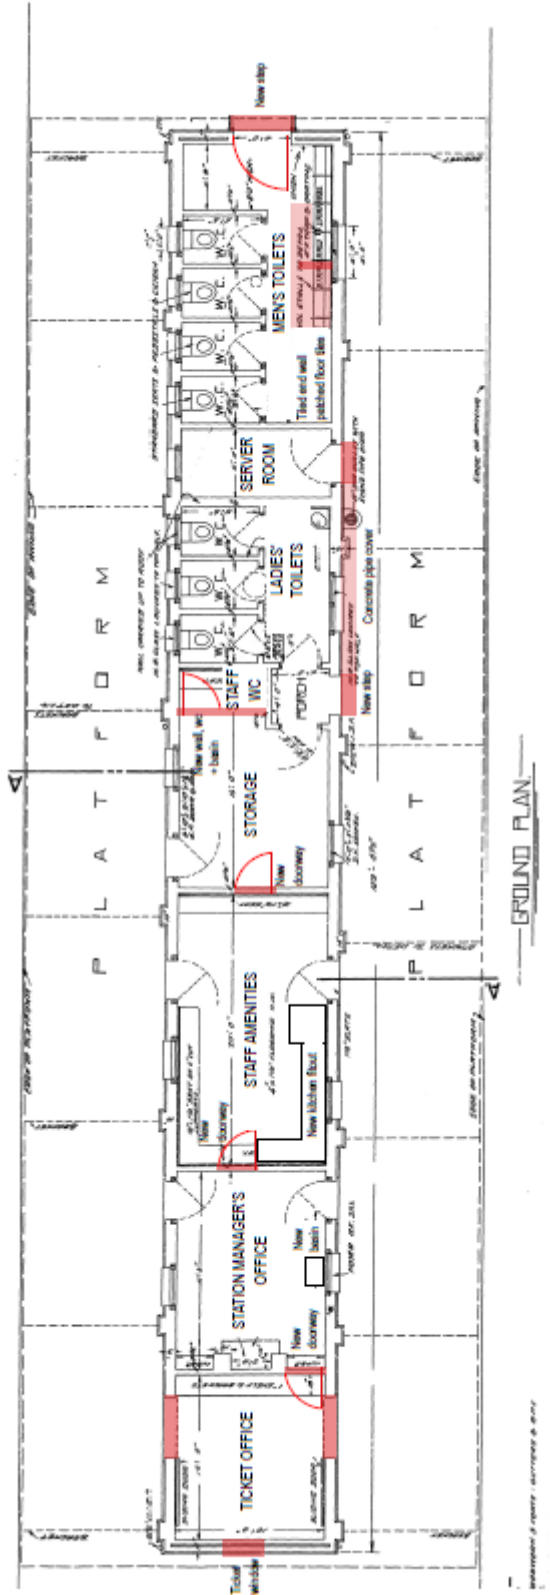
Platform building floor plan showing modern alterations. Source: TfNSW
